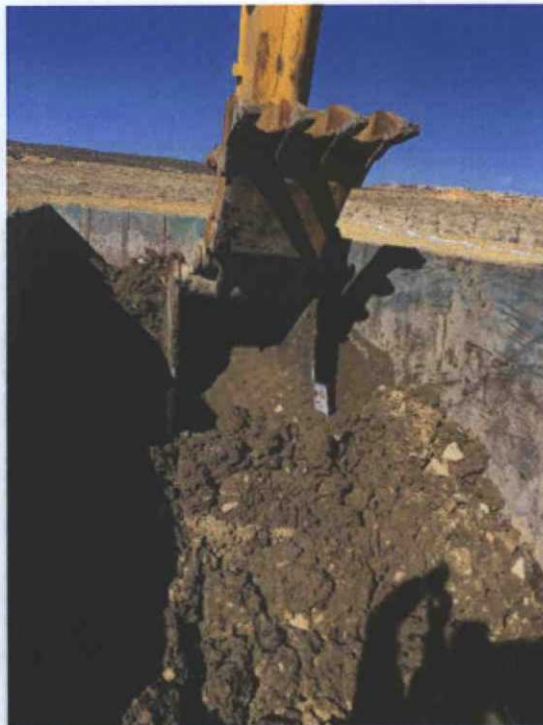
Mixing the drill cuttings with clean soil from trench excavation. Stabilization was achieved at a ratio of 1 (clean): 1 (cuttings).
